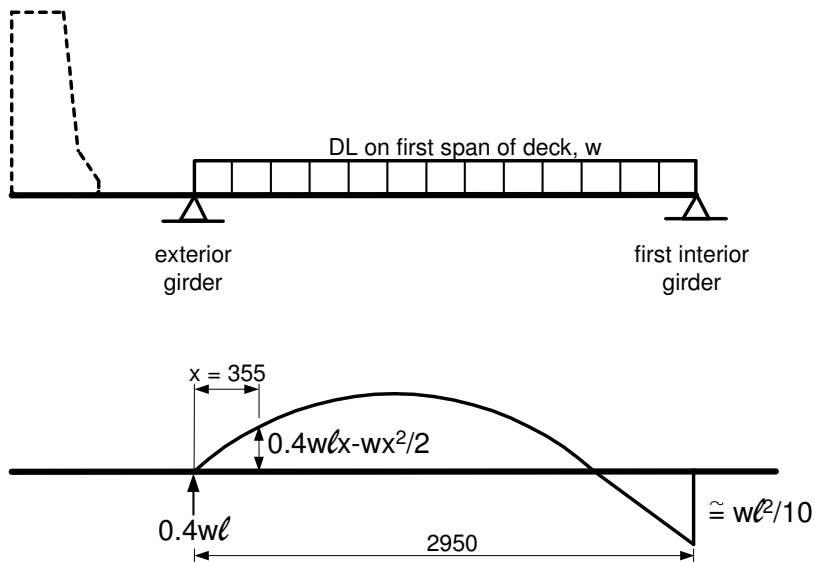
Dead Load Moment at Design Section Due to Dead Loads on the First Deck Span
